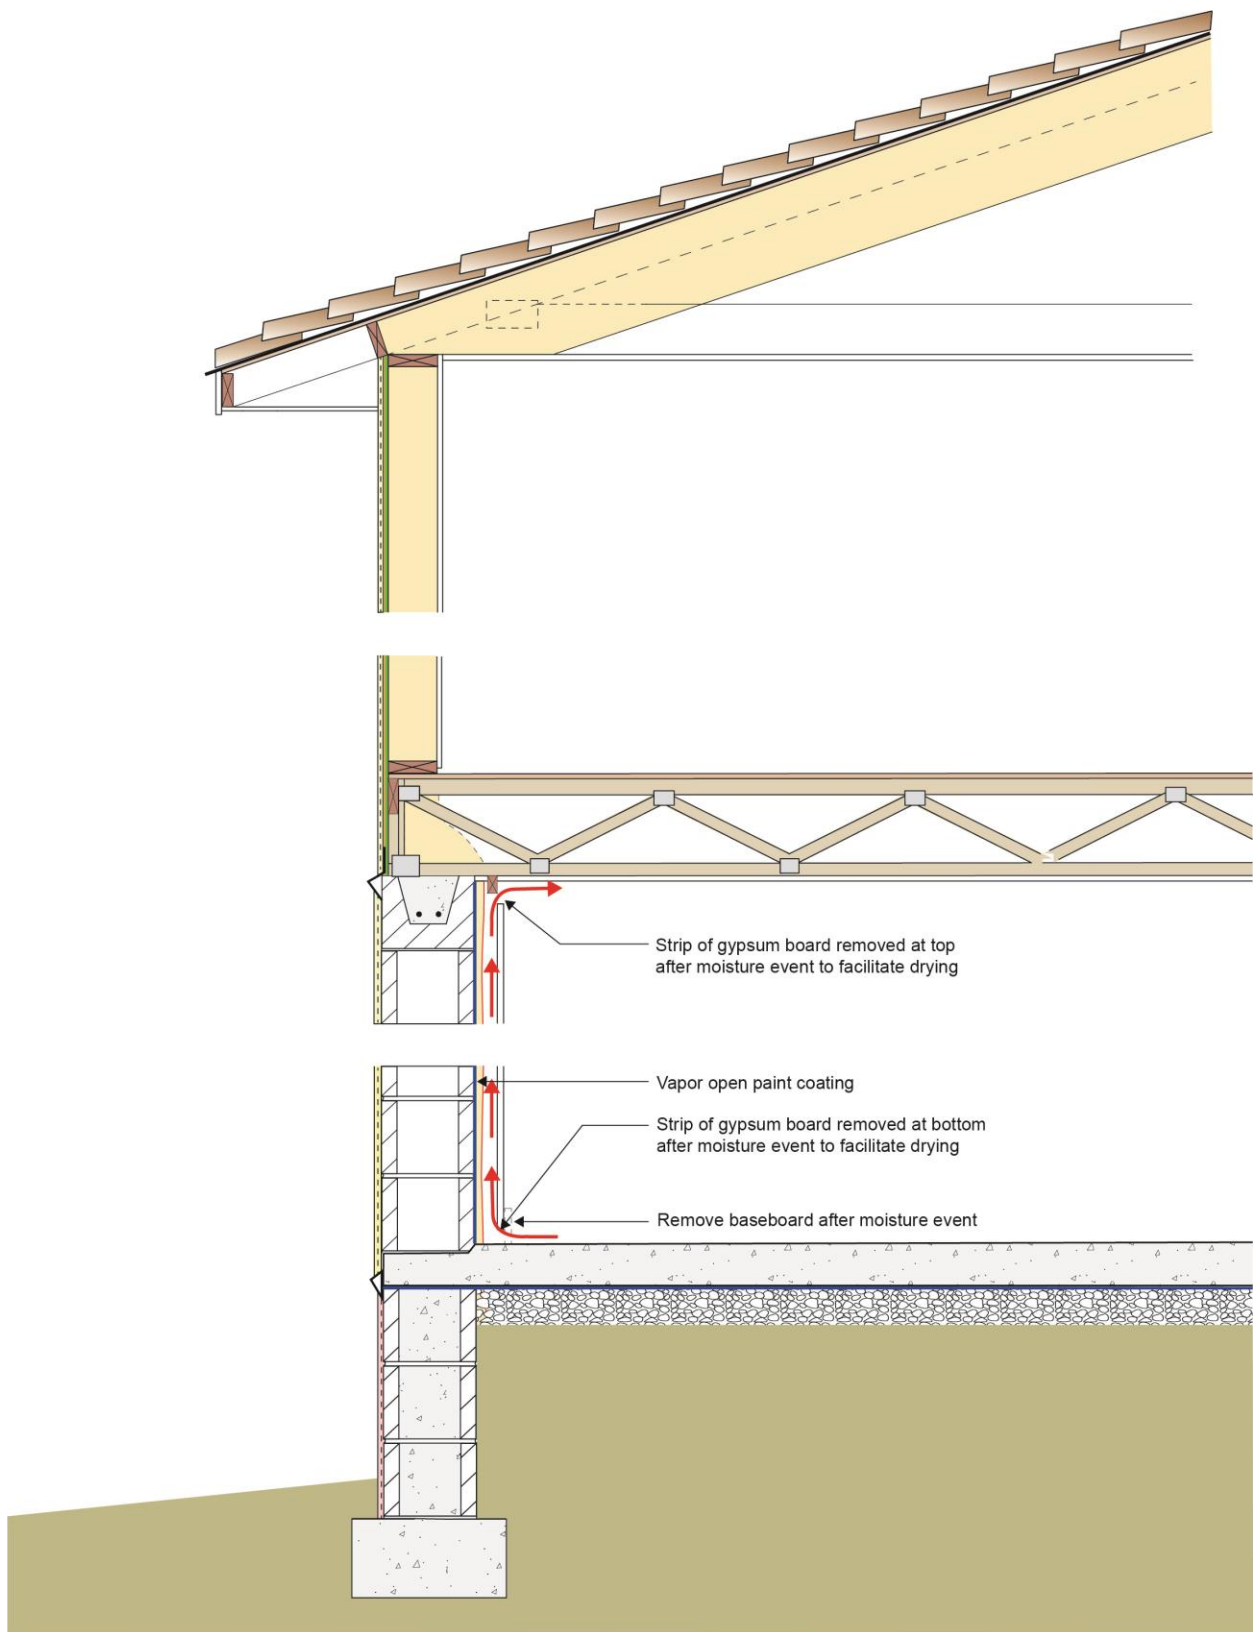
Construct Using Moisture Insensitive Materials - First floor should be constructed out of moisture insensitive materials such as concrete block or pre-cast concrete. Upper floors can be constructed from wood frame.
